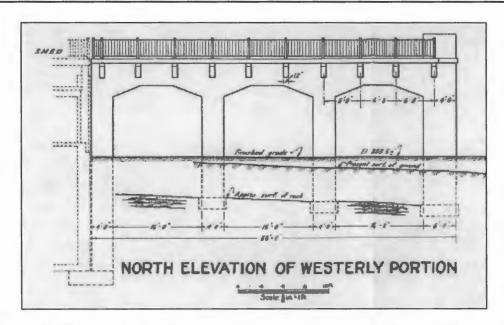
, "Reinforced Concrete Railroad Trestle - Elevations & Sections "" Drawing 49, Bid Package No. 29; W. H. Dittoe, Chief Engineer, April, 1930 (partial view)
